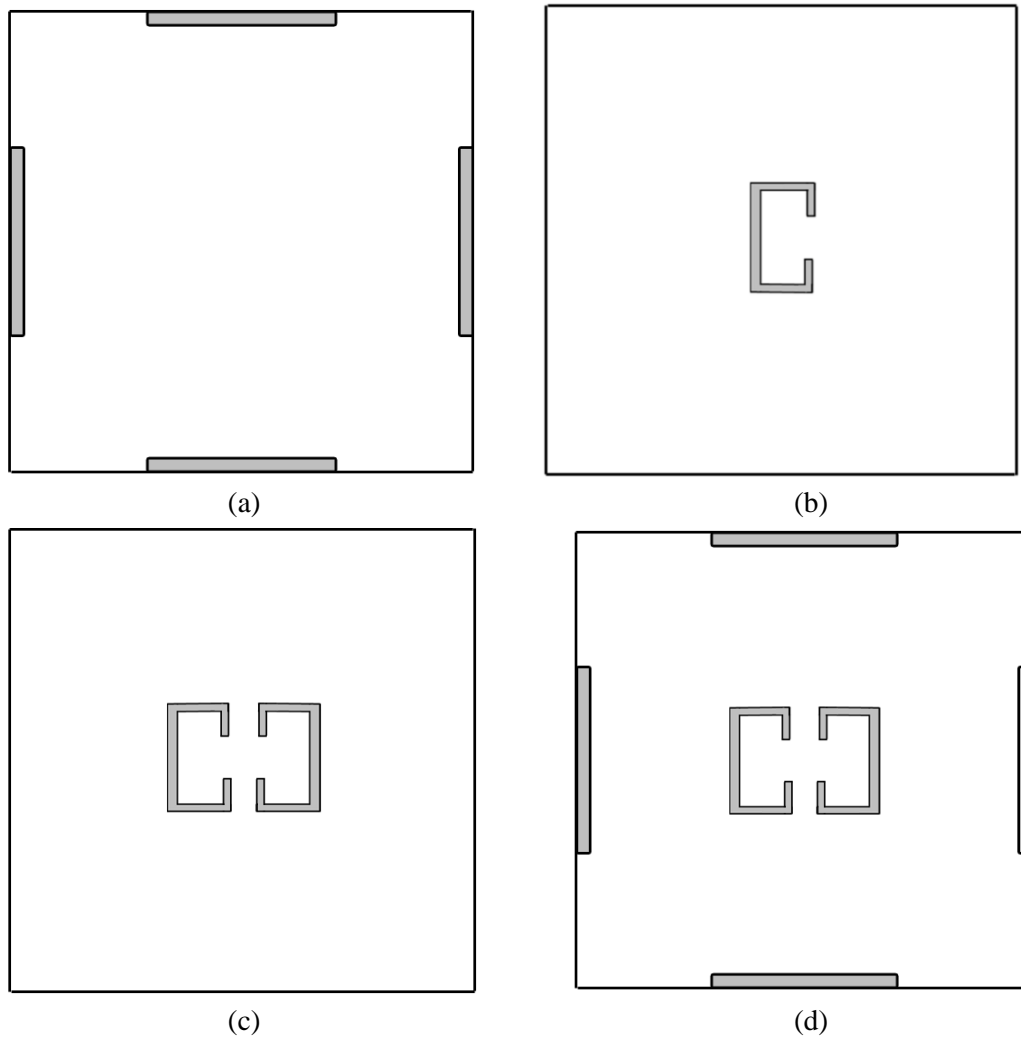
THE DIFFERENT IDEALISED BUILDING CONFIGURATIONS USED FOR RC BUILDINGS IN AUSTRALIA (A) TYPE 1 (B) TYPE 2 (C) TYPE 3 AND (D) TYPE 4
